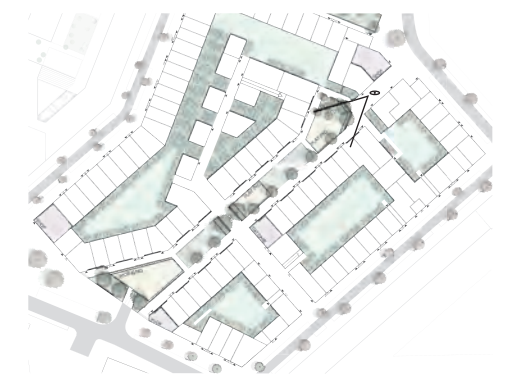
The central square surrounded by building offer outdoor eating and playing facilities. By author
